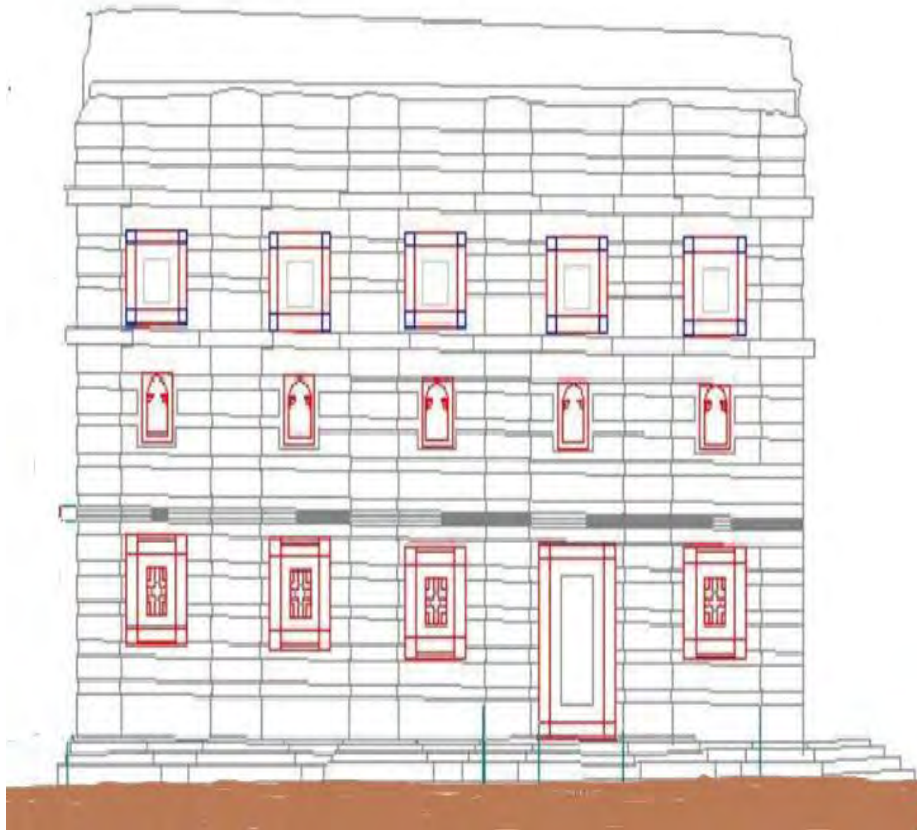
The Left (South-North Orientation) Side Elevation Plan of Bete Amanuel
